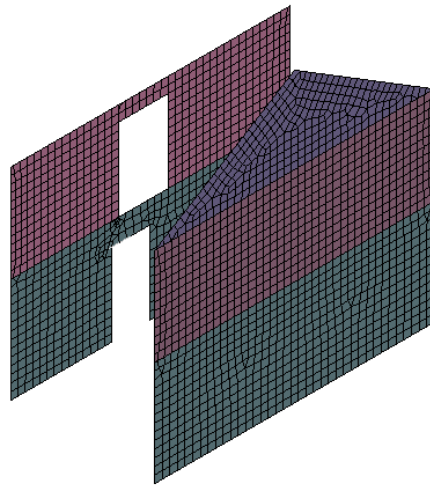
MODELLING OF INTERIOR WALLS
